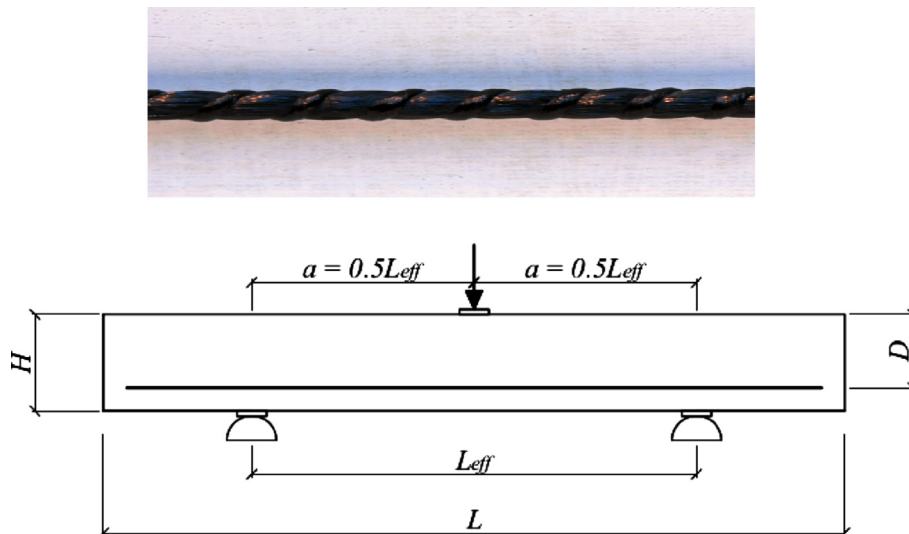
View of basalt BFRP ribbed bar and static scheme of slender concrete beams under 3-point bending (H – beam height, L – beam length, L_{eff} – beam span, D – effective beam height, a – shear span).
